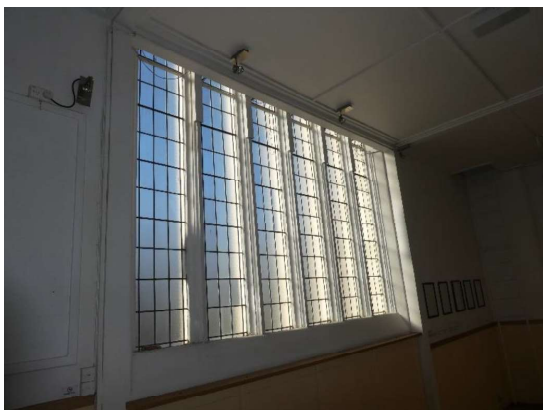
Showing the horizontal steel reinforcing / strengthening bar to the inside of the mullioned window. Noting cracking to the stone surround.
